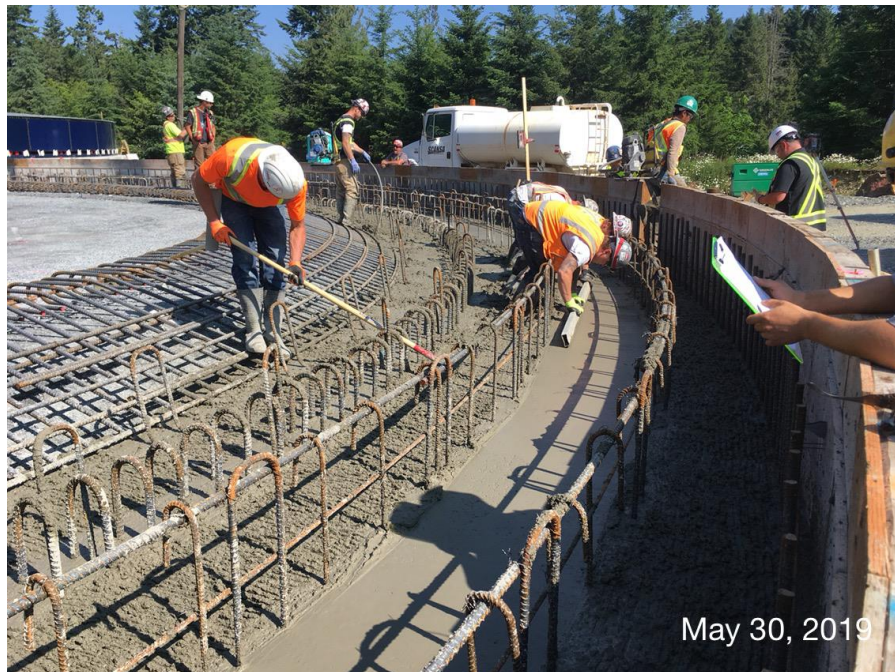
Residuals Treatment Facility – Concrete placement and finishing for digested sludge storage tank slab first pour.
